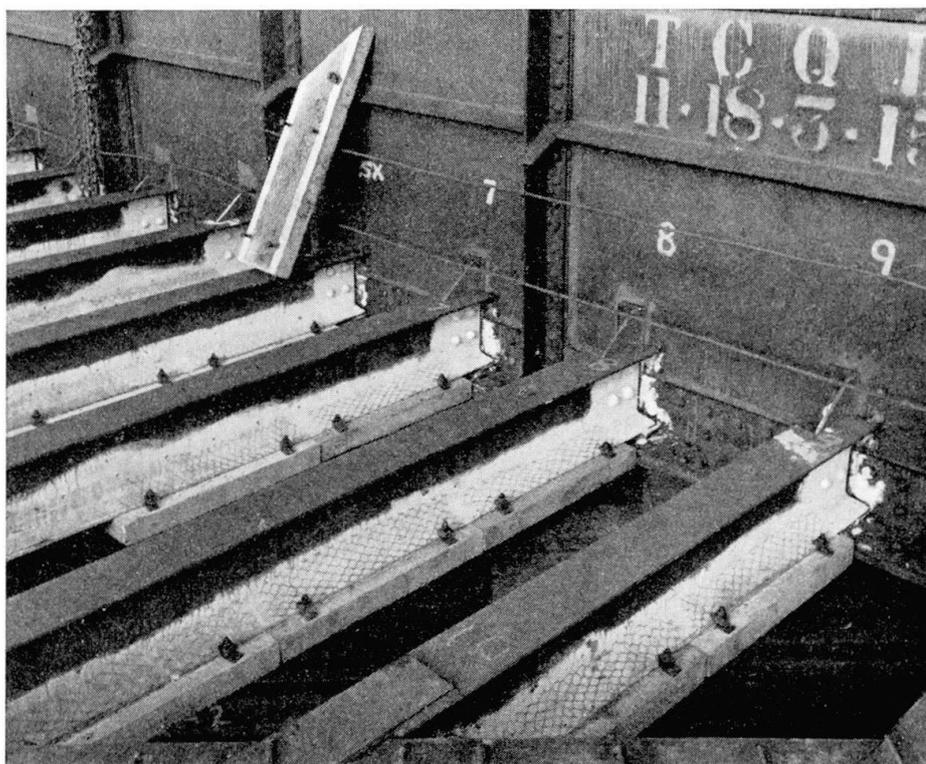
Transverse steel joists with precast concrete slabs protecting the bottom flanges
